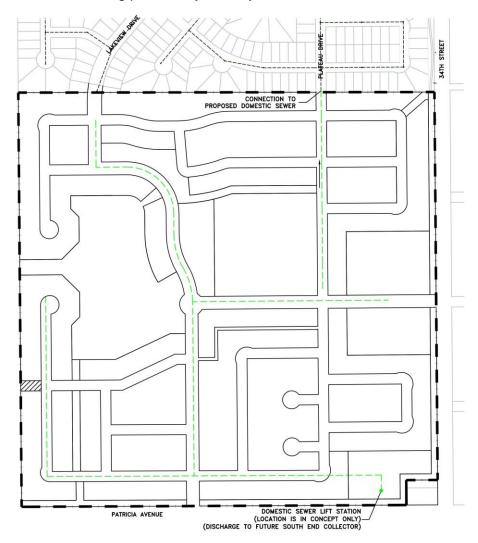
WASTEWATER COLLECTION SYSTEM LAYOUT
